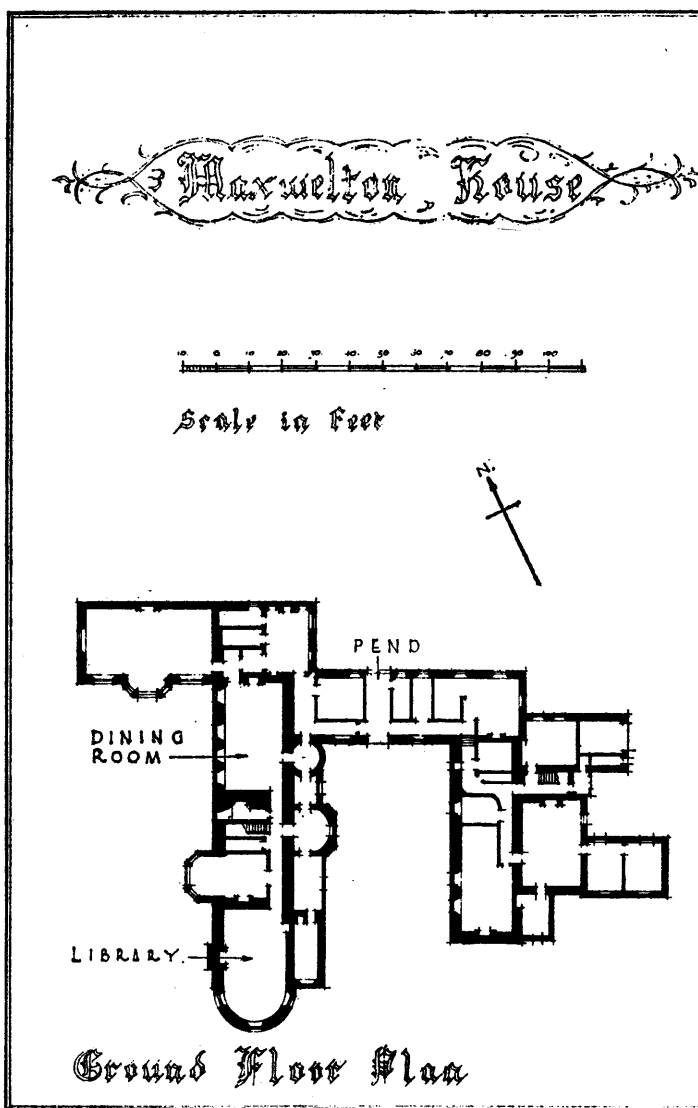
MAXWELTON HOUSE—GROUND PLAN.
